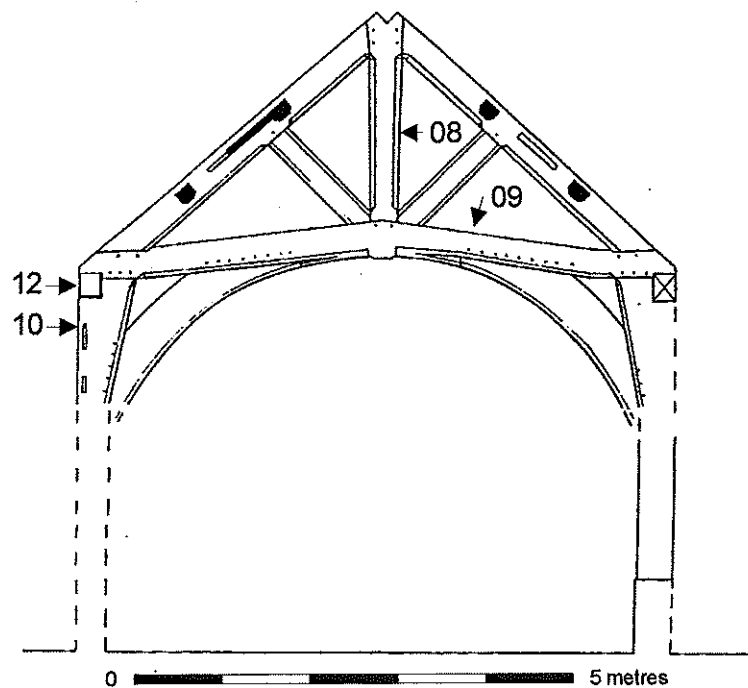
West-facing, idealised elevation of truss 2 (equates with section D-D1 in Corbett 1993) indicating sample locations
